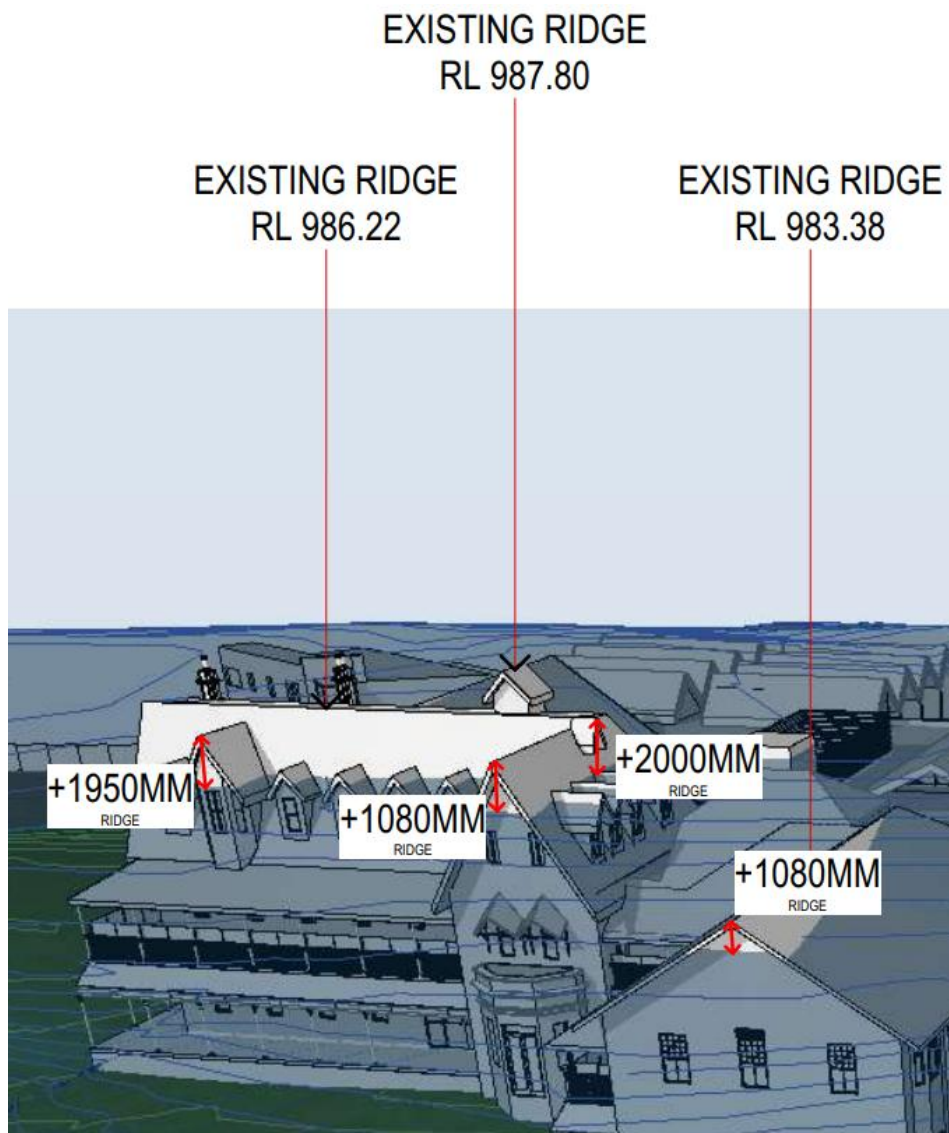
Existing variation on The Ritz building A1 roof (Source: PBD Architects)
